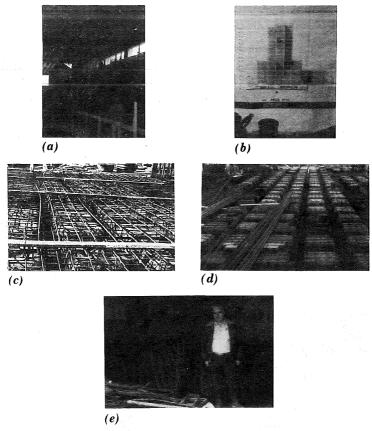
Example 1: (a) Bottom View of Typical Waffle-Slab Section; (b) 22-Story Complex; (c) Original Reinforcement Pattern; (d) Improved Method, Leaving Channels Open in Both Directions; and (e) Piles of Modular "Cages" Beside Assembling Area
